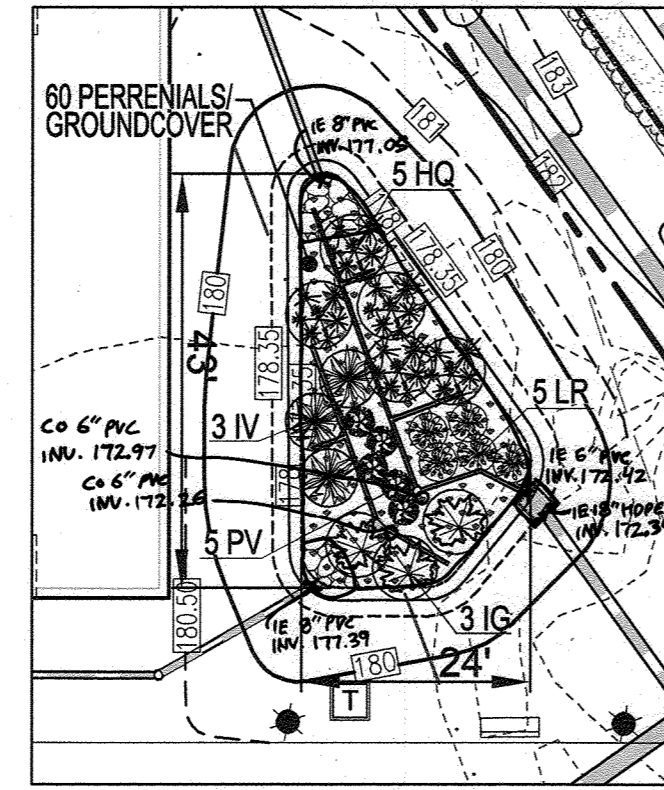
DETAILED BIO AND PLANTING PLAN (SWM #18 & 19)
